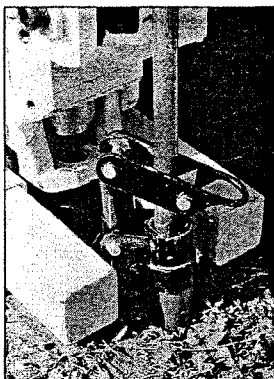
The DT21 Rod Clamp Assembly holds the inner rod string while adding or removing 1.0-inch rods.
